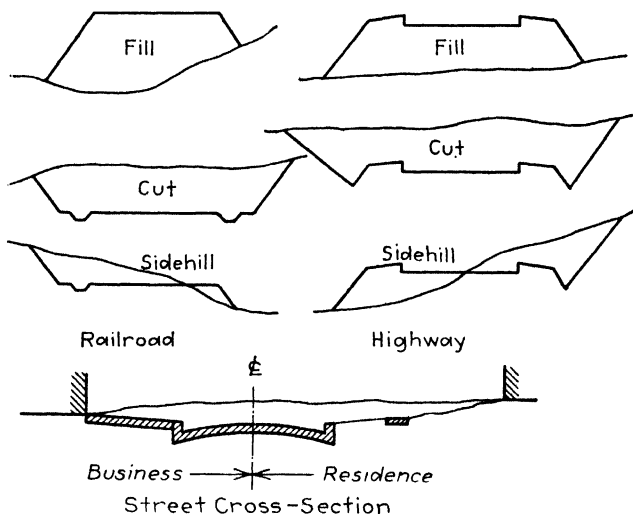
Typical roadbed sections for railroad, highway and street.
